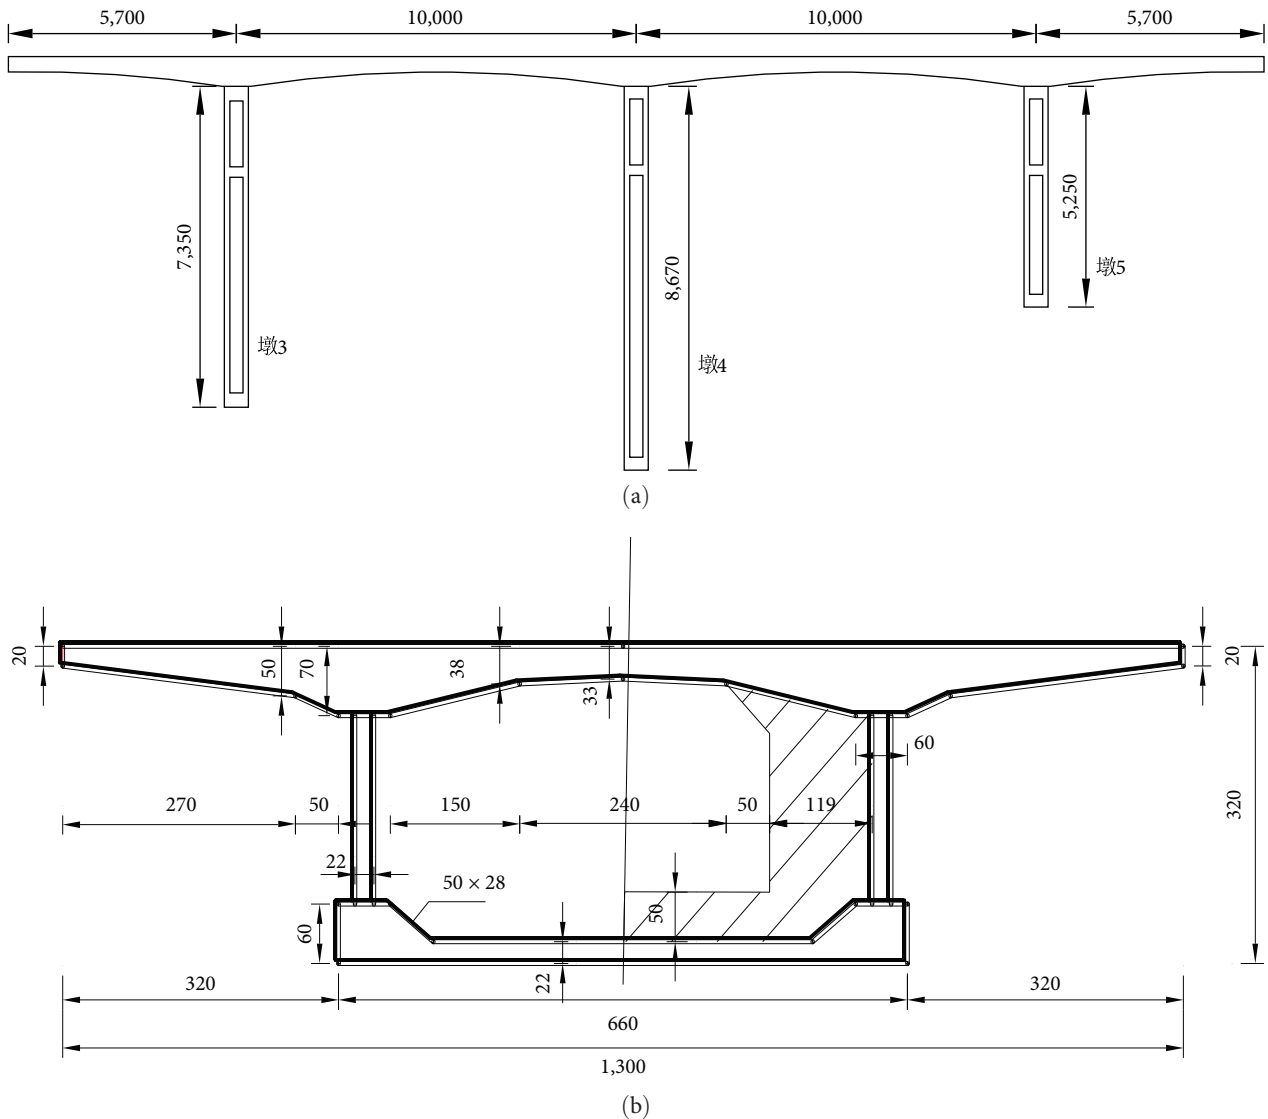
Structural diagram of Xiaoshagou bridge: (a) elevation view and (b) cross-sectional dimensions.
